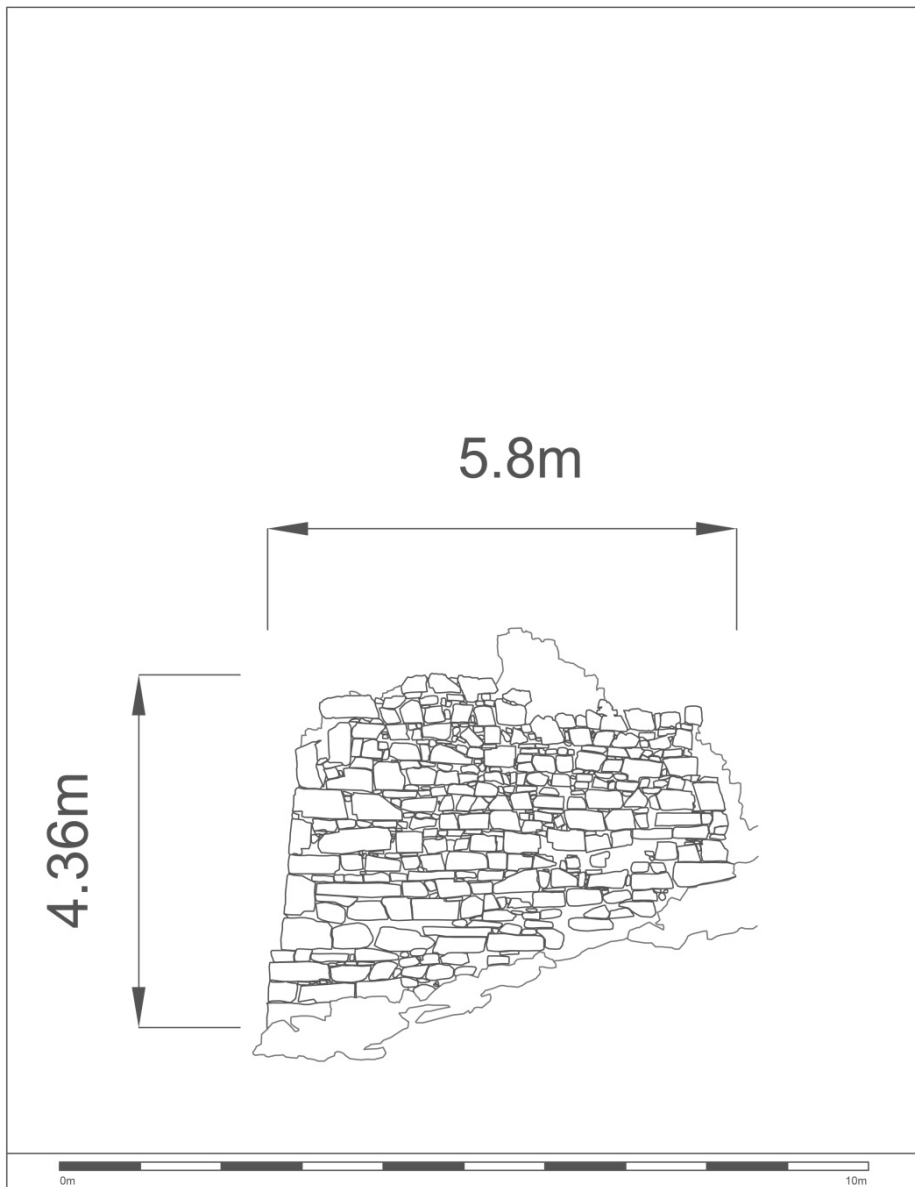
External elevation of the north wall of the collapsed signal tower at Cleggan Hill Signal Station.
